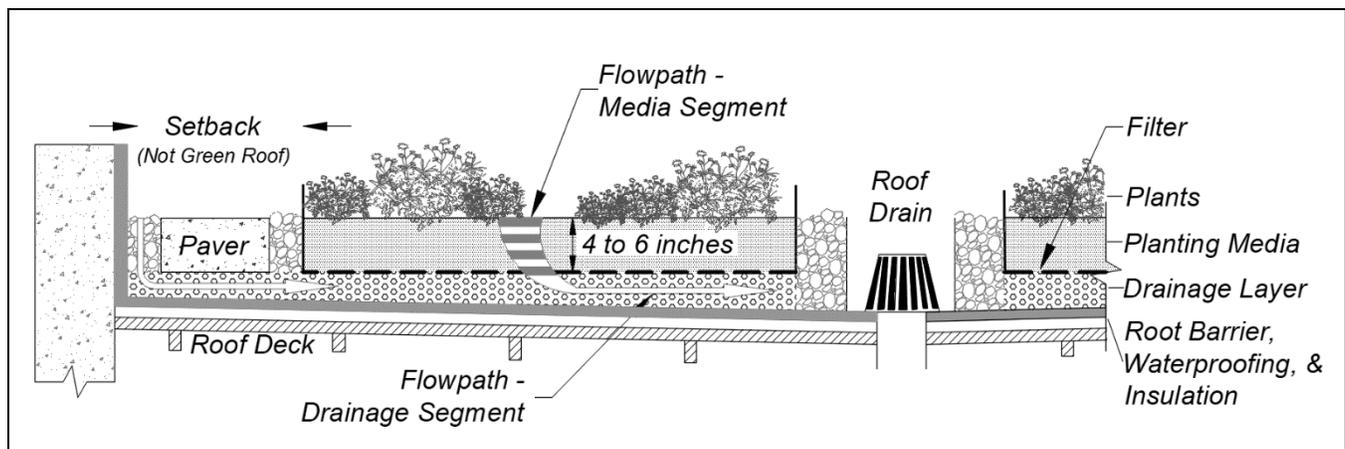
Typical Cross-section of an Extensive Green Roof for Stormwater Control (not to scale)
